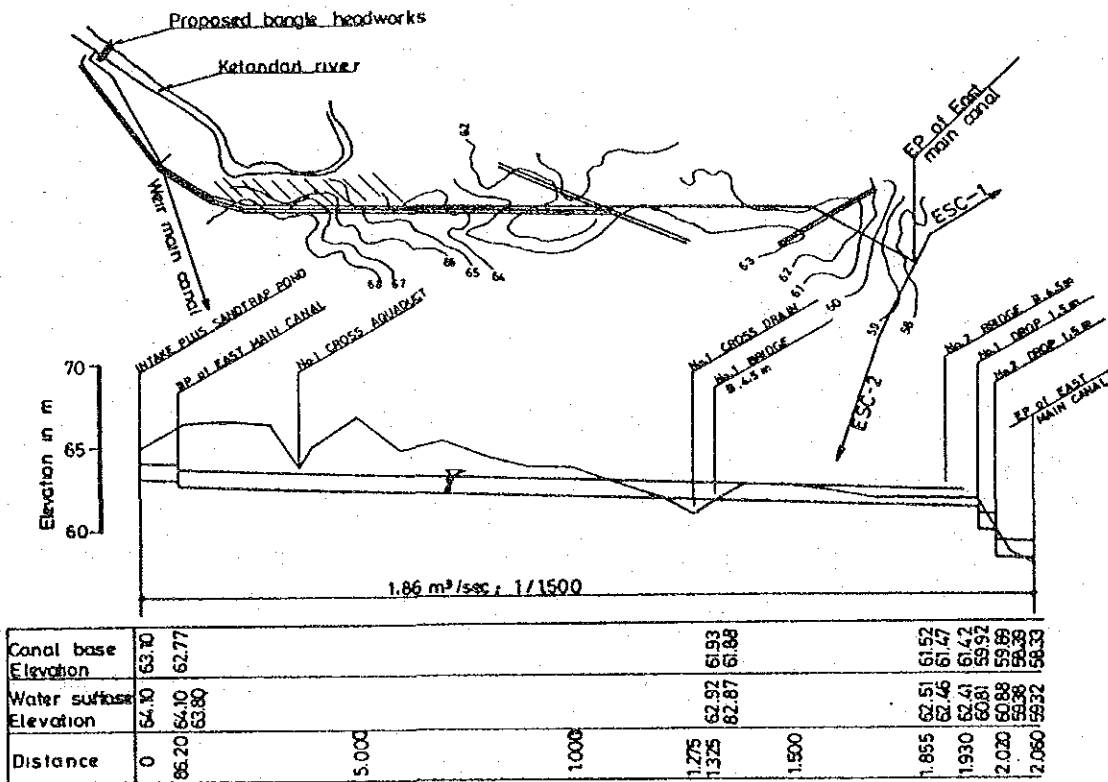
PLAN AND PROFILE OF EAST MAIN CANAL
